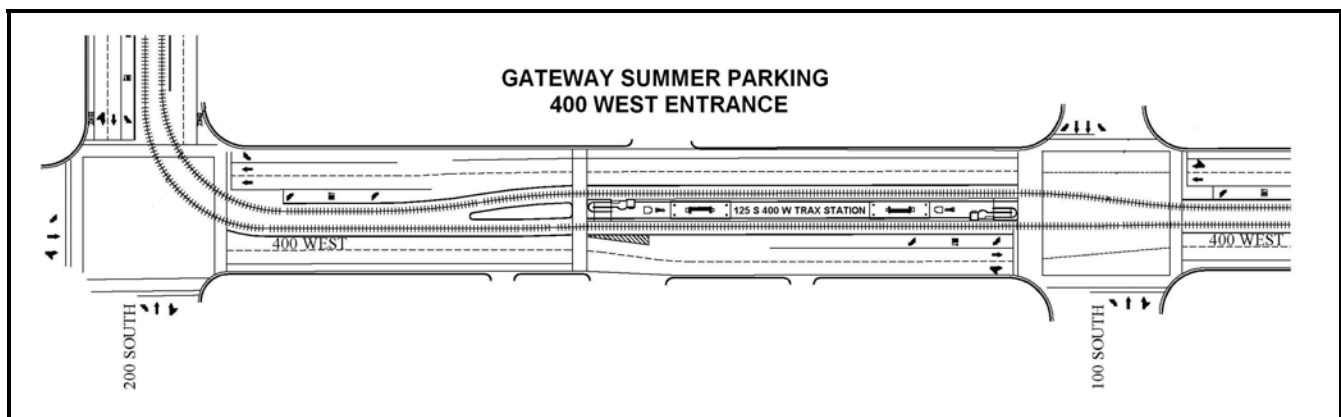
125 South 400 West Station (construct with TRAX Connection)
